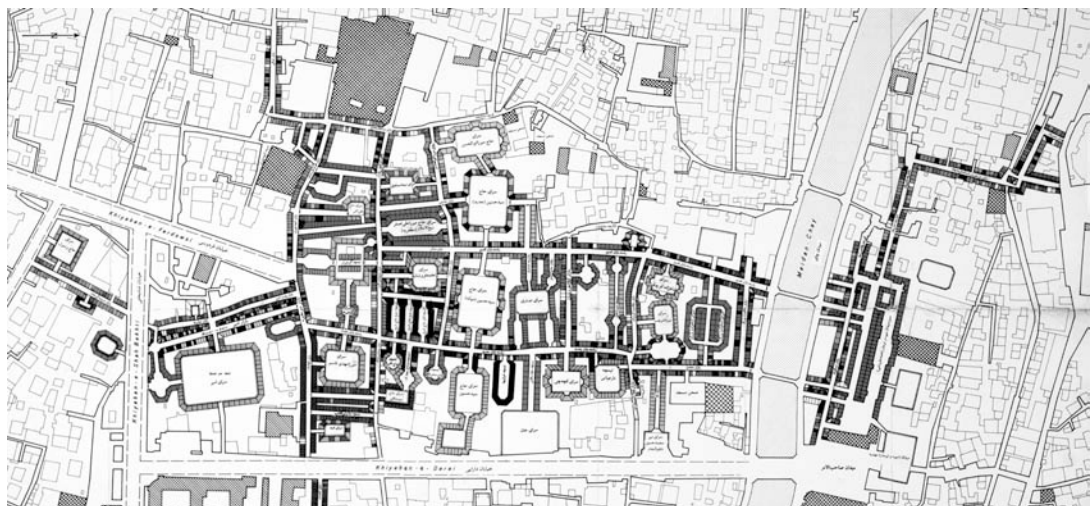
Plan of Tabriz bazaar structure with *raste bazaar* & open courtyards (source: Tehrani 2005)
